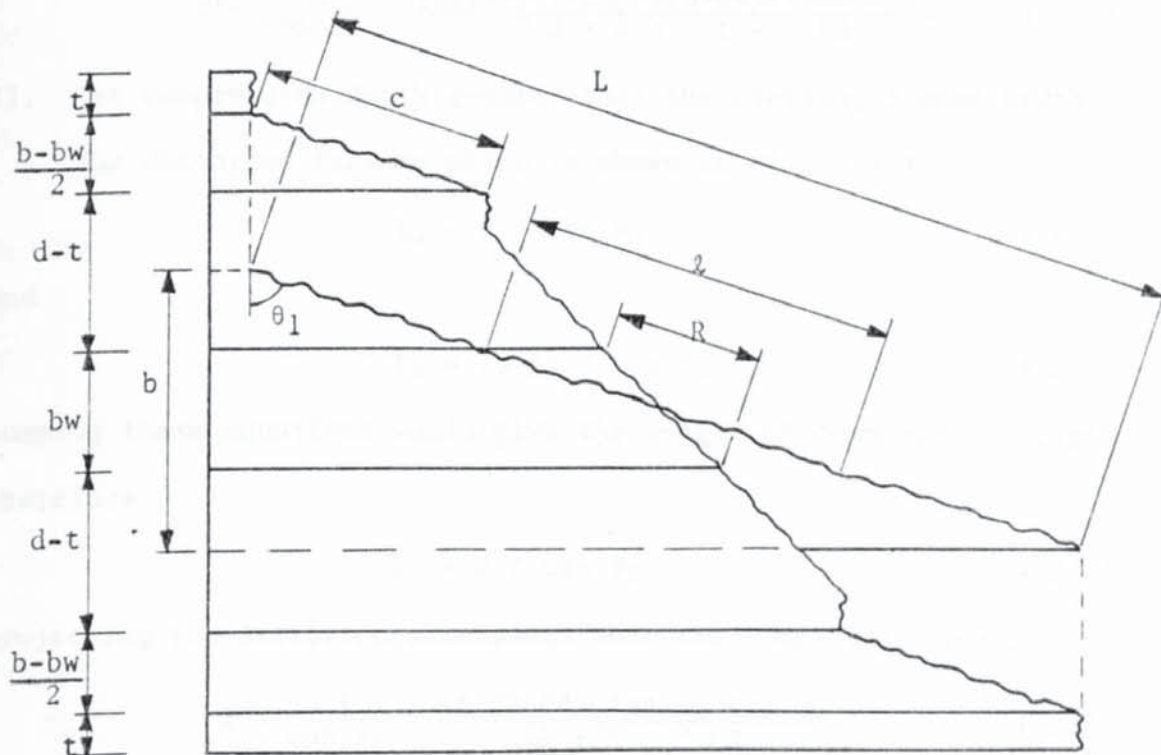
MODE ONE FAILURE IN PLAIN CONCRETE T-MEMBERS - II
